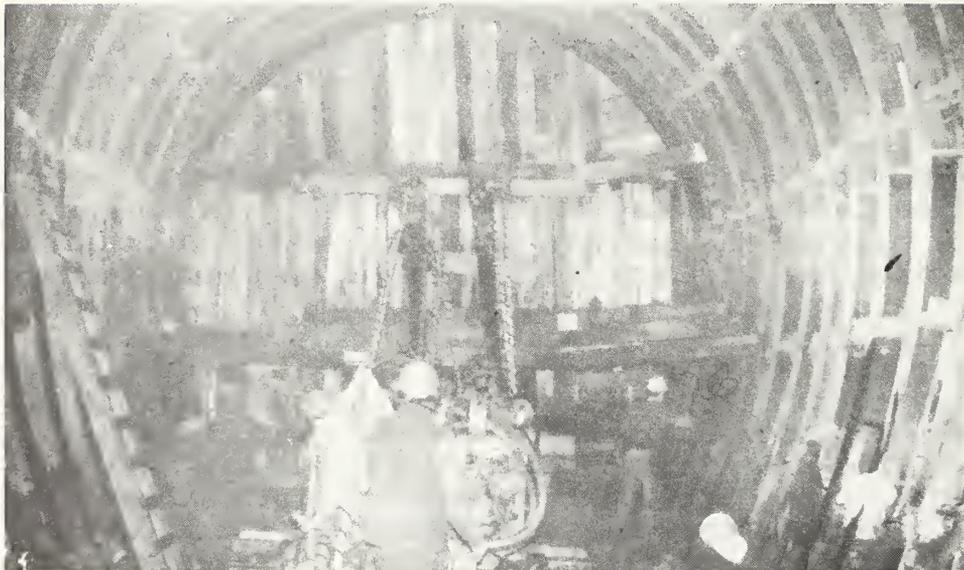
BULKHEAD CONSTRUCTED AT END OF FULL FACE ROCK TUNNEL PRIOR TO COMMENCEMENT OF INVERT DRIFT
